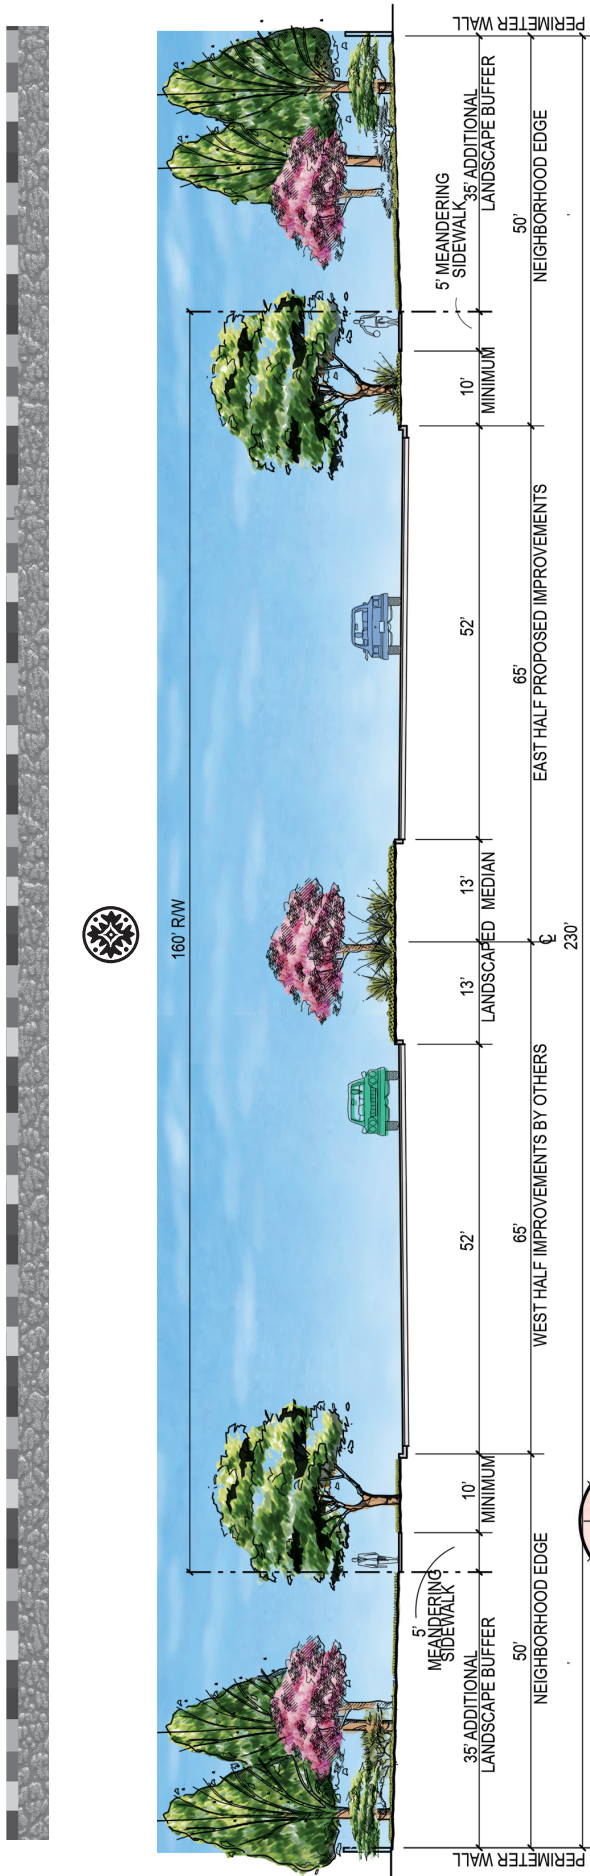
CONCEPTUAL LANDSCAPE MASTER PLAN
